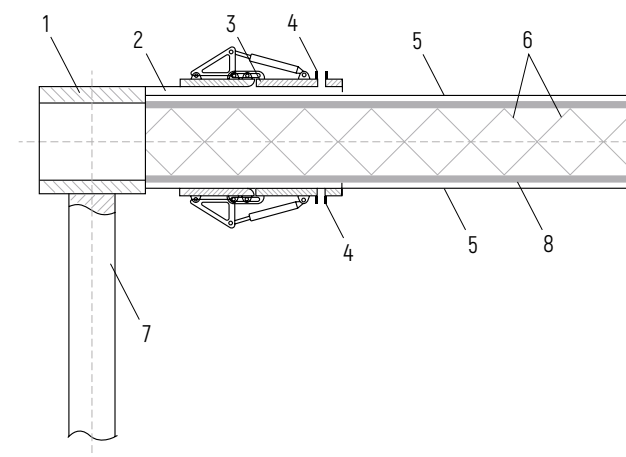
Technological process of concreting the span of the GPV overpass with the help of a concrete paver:
